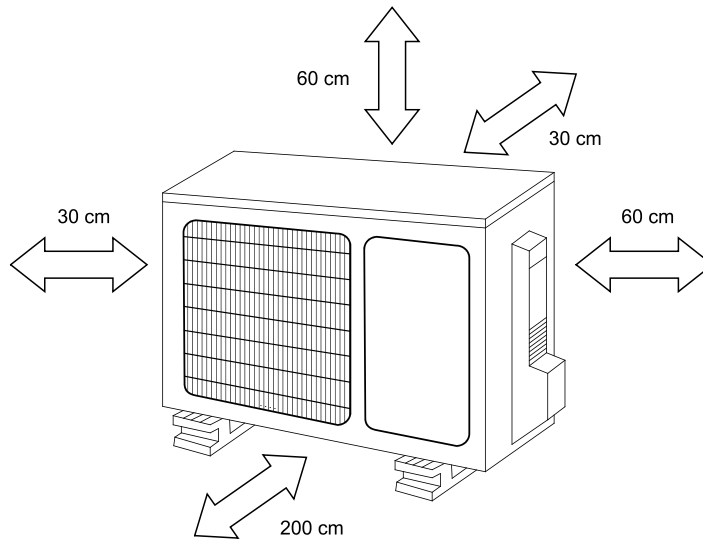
installation dimensions of the outdoor unit – the aggregate
